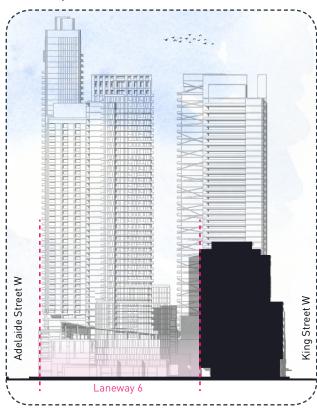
Enlarged Site Section B.C; 1:1,800 2014-, section
